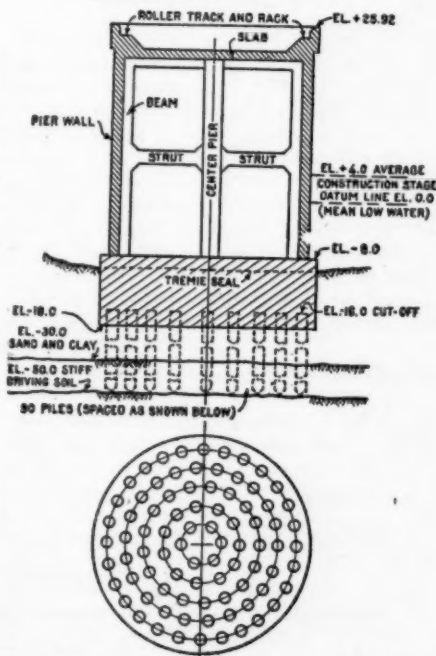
Details of First Design of Pier for Swing Span Over Coquille River Showing Foundation Conditions Expected
